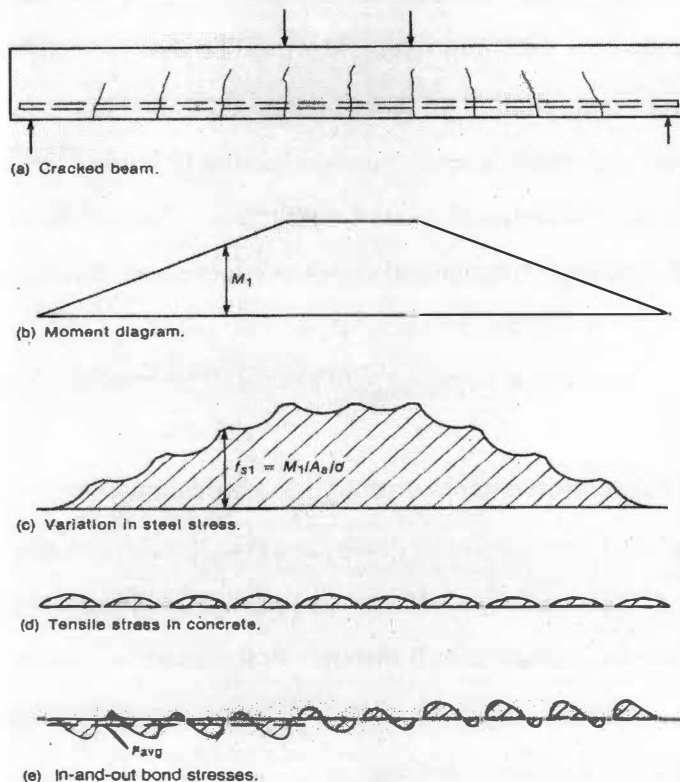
Steel, Concrete, and Bond Stress in a Cracked Beam (MacGregor 2005).
